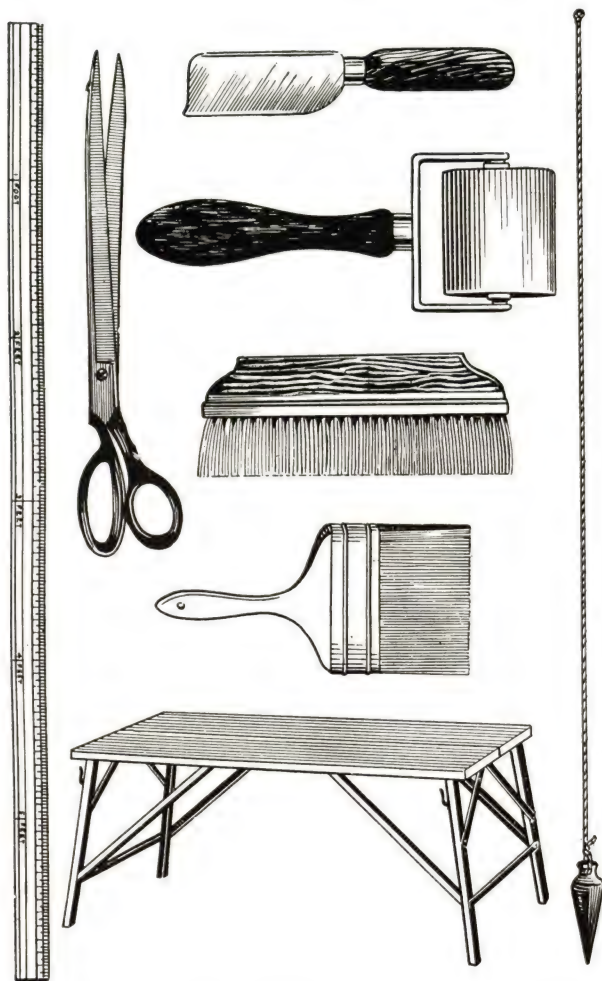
The Tools Needed for Hanging Wall Fabrics.
